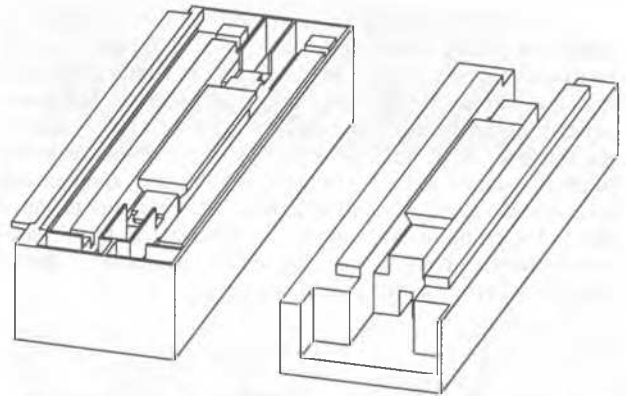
Simplification of the foundation geometry for calculation in 3D state
